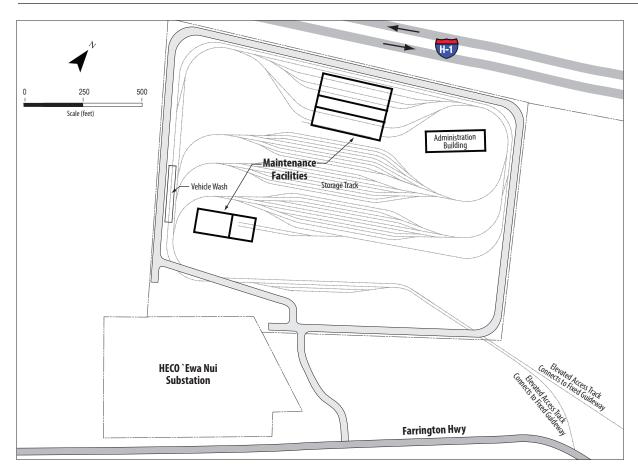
Maintenance and Storage Facility in Ho`opili Location and Conceptual Layout
